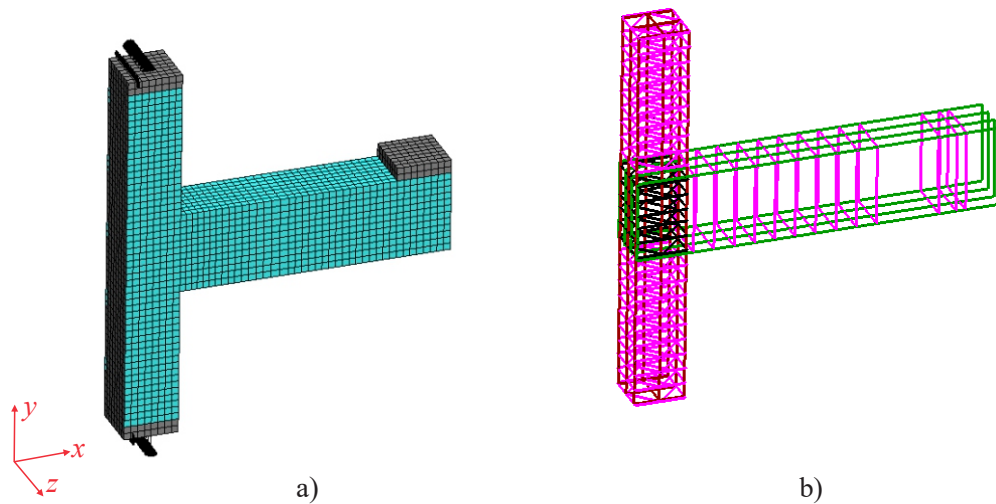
Finite element discretization a) Concrete b) Reinforcement.
